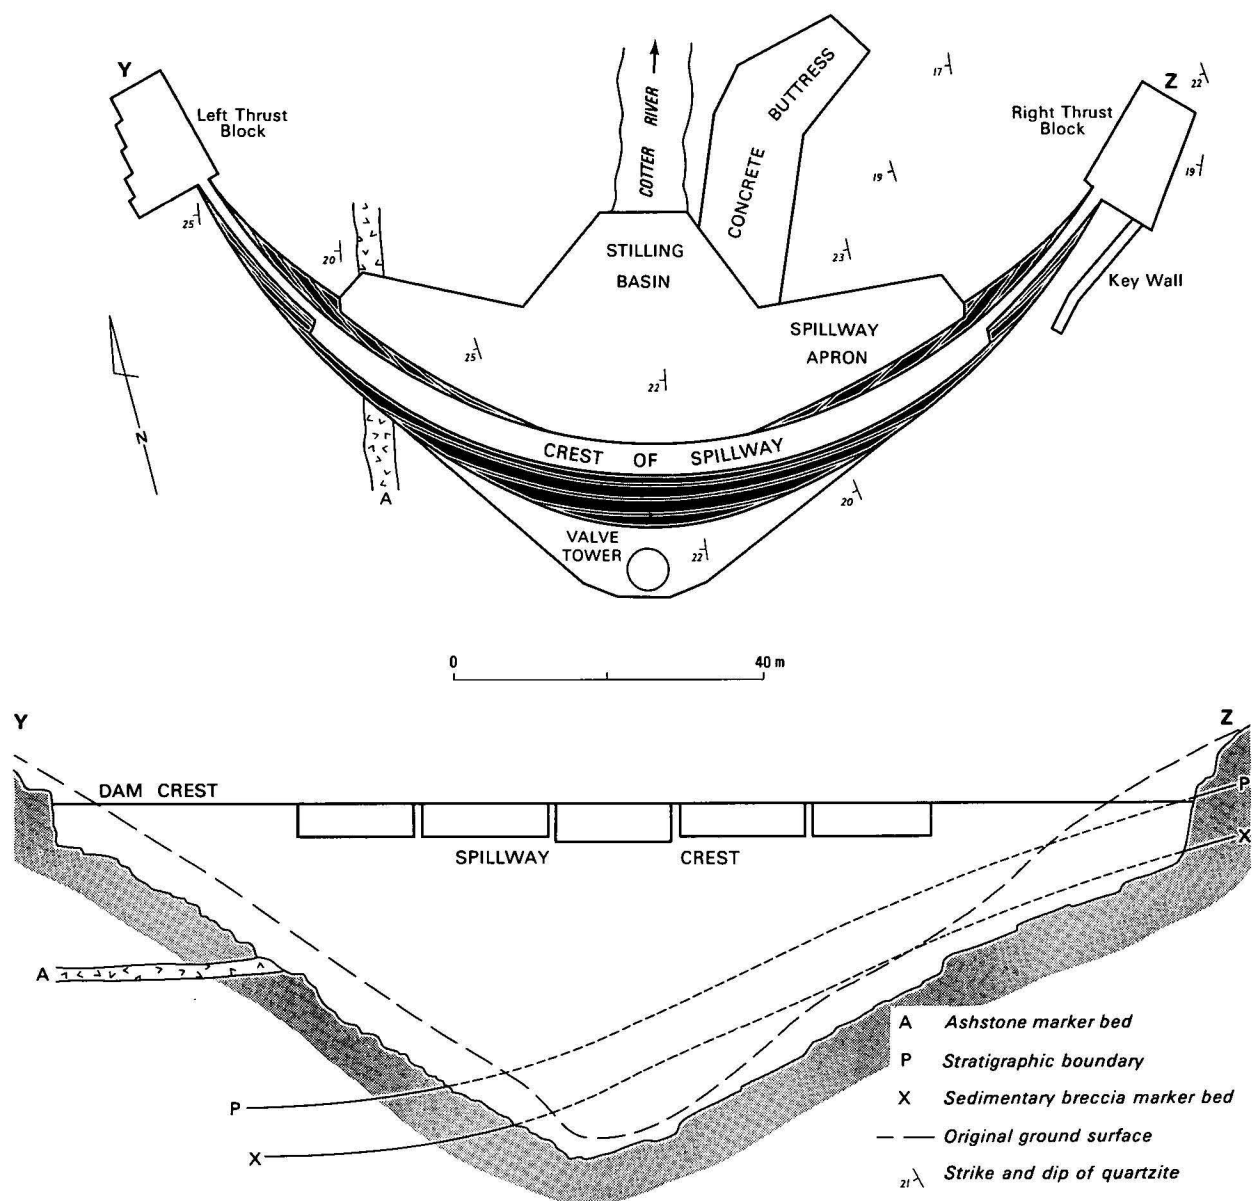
Bendora Dam site, showing generalised foundation geology and layout of engineering structures.
